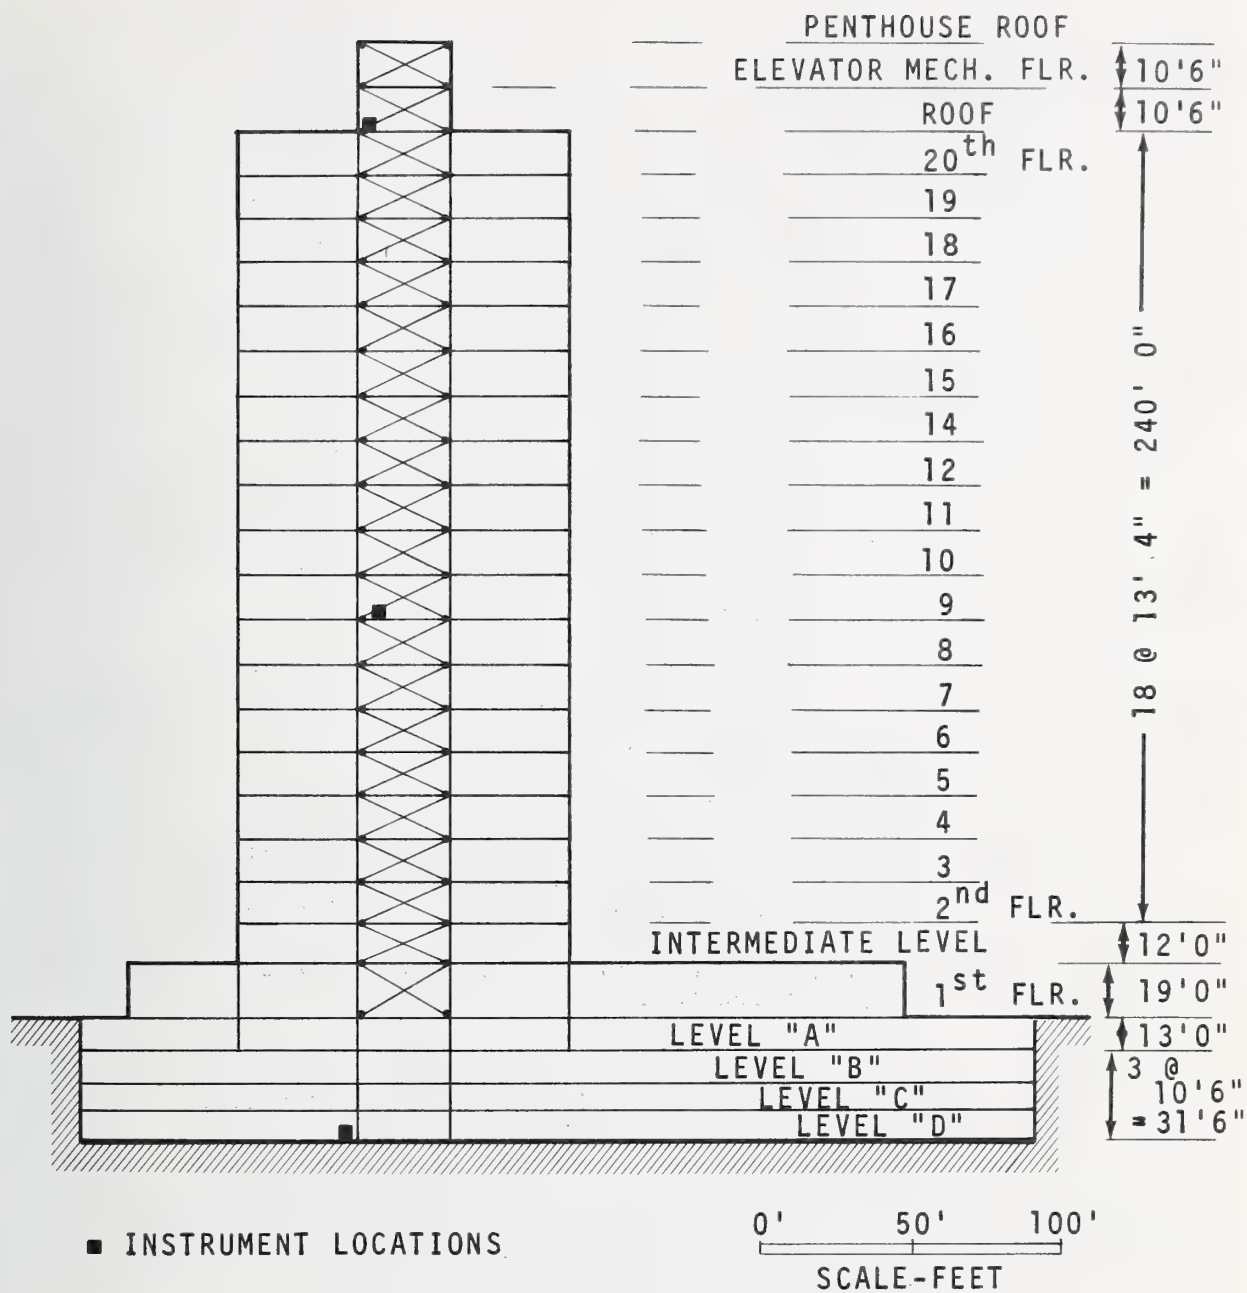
Elevation of N46°W Frame -- Building No. 37
